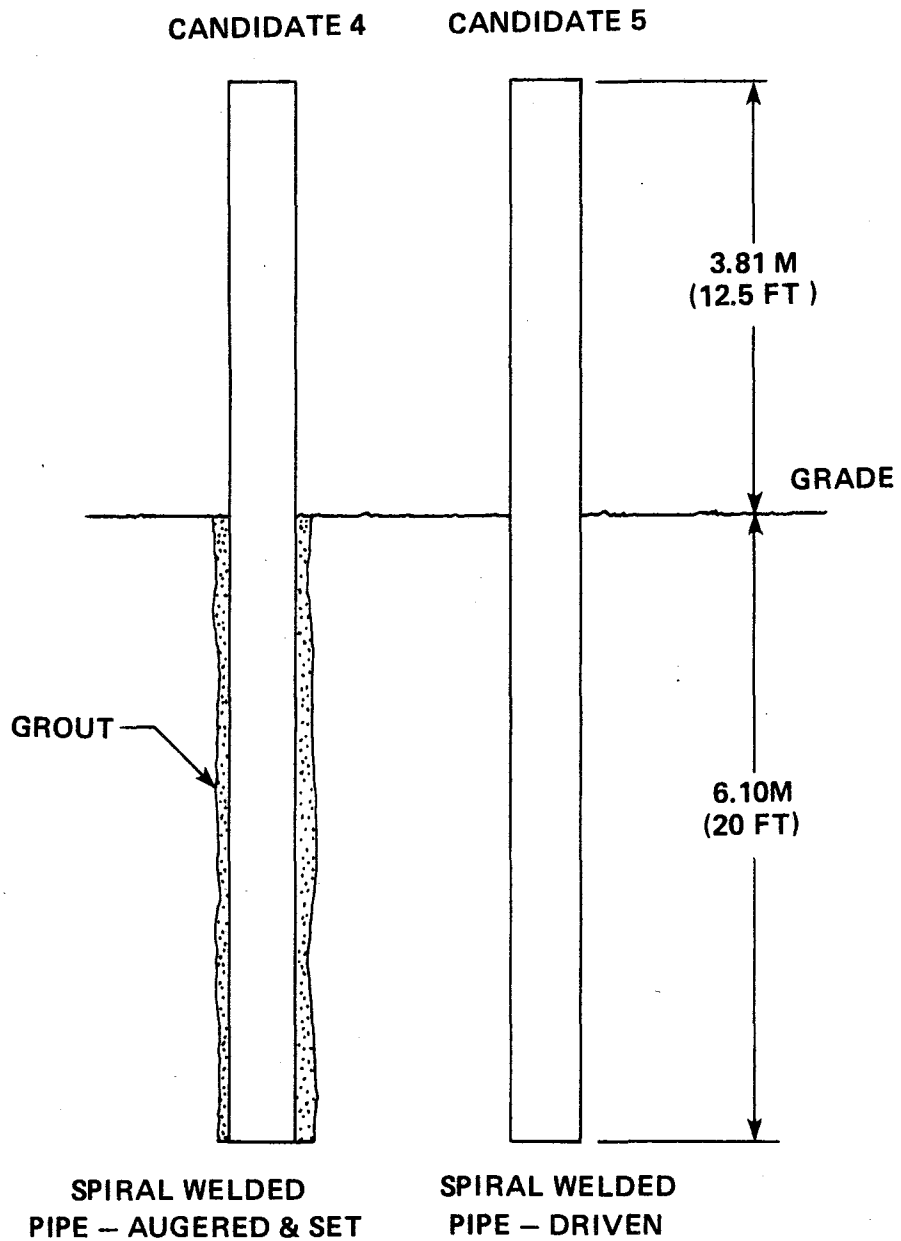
CANDIDATE FOUNDATIONS – STEEL PIPE
